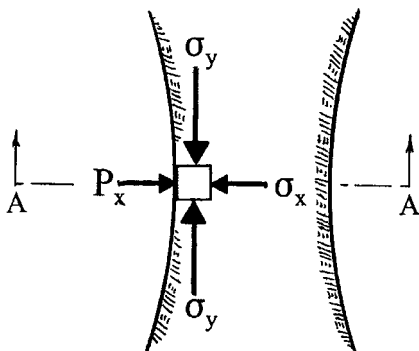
Detailed Pipe-Soil Column Between Parallel Pipes.
